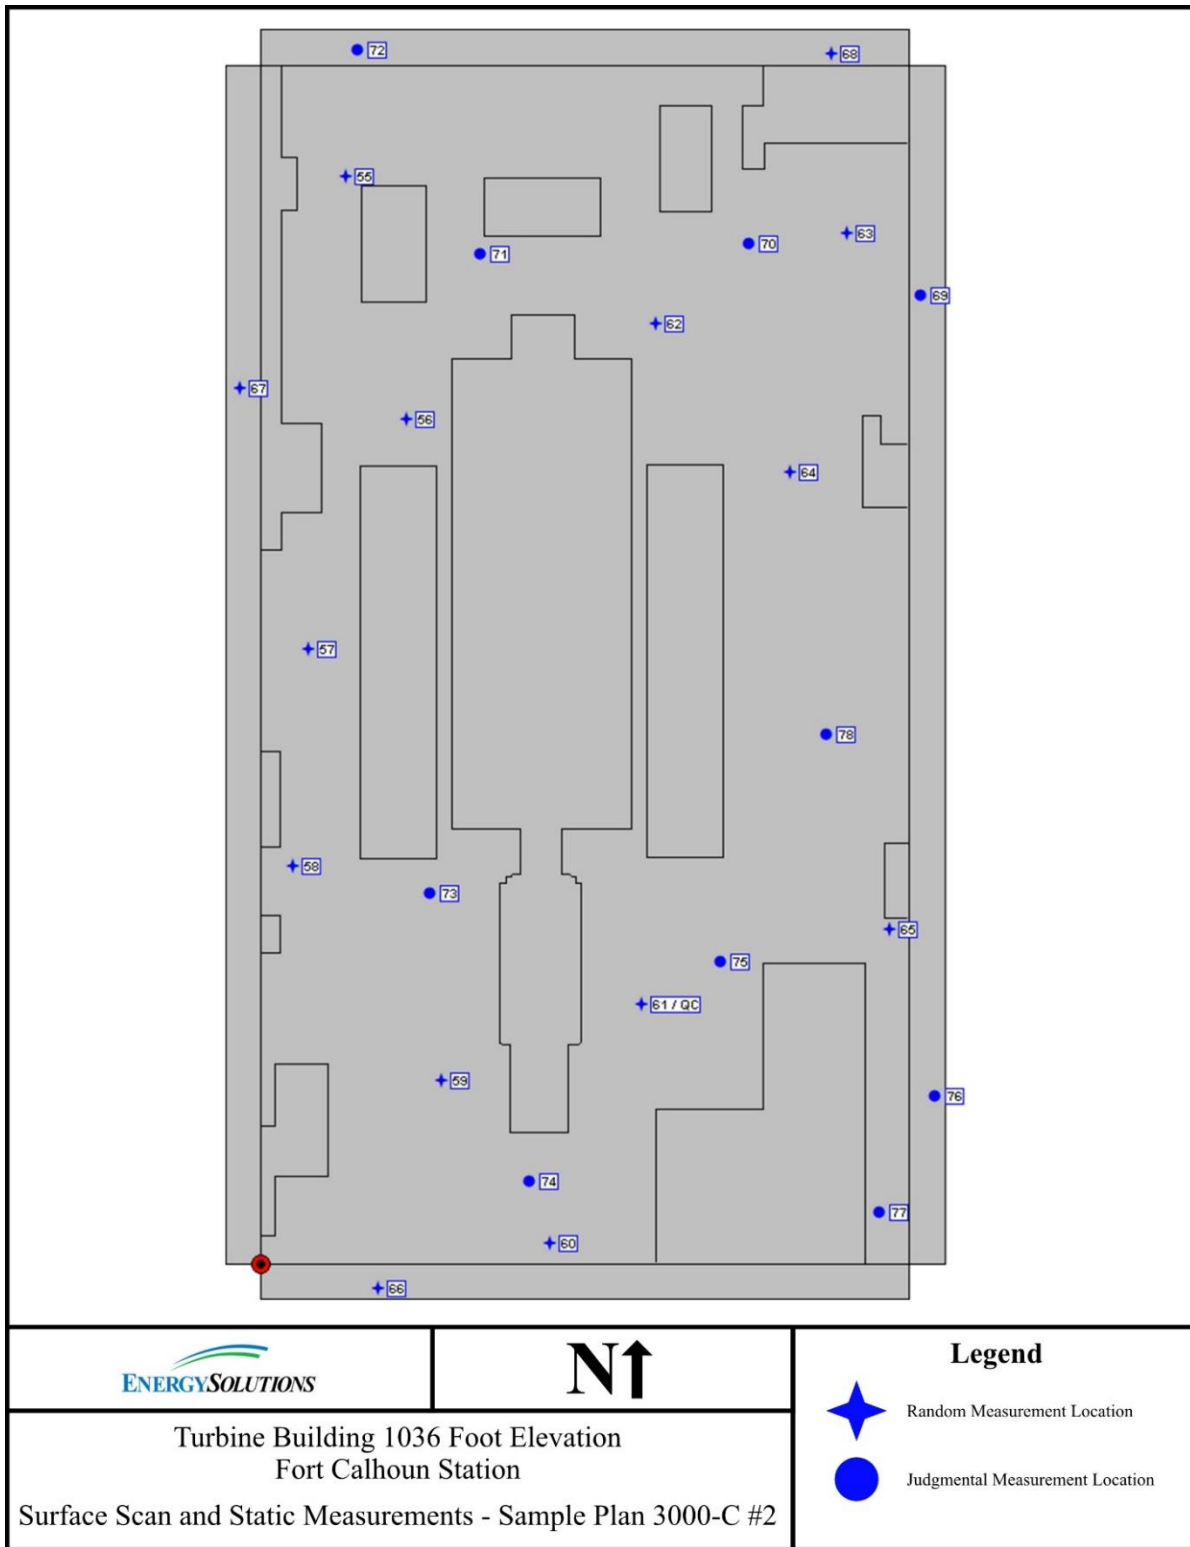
Turbine Building 1036 Foot Elevation Surface Measurement Locations
